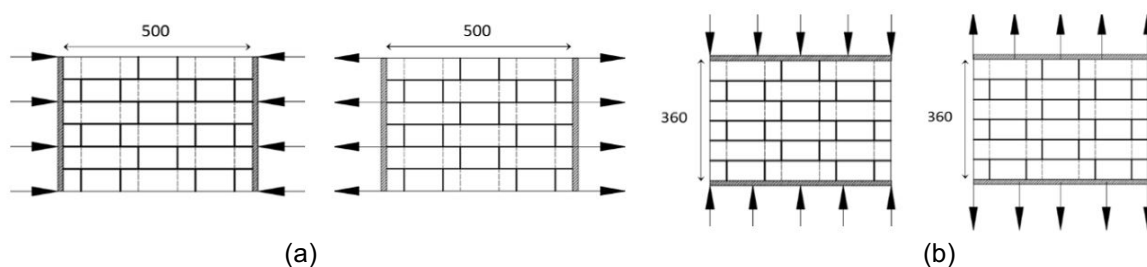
Discrete cracking models of masonry panels under compression and tension. (a) Load applied parallel to bed joints. (b) Load applied perpendicular to bed joints (dimensions are in mm)
